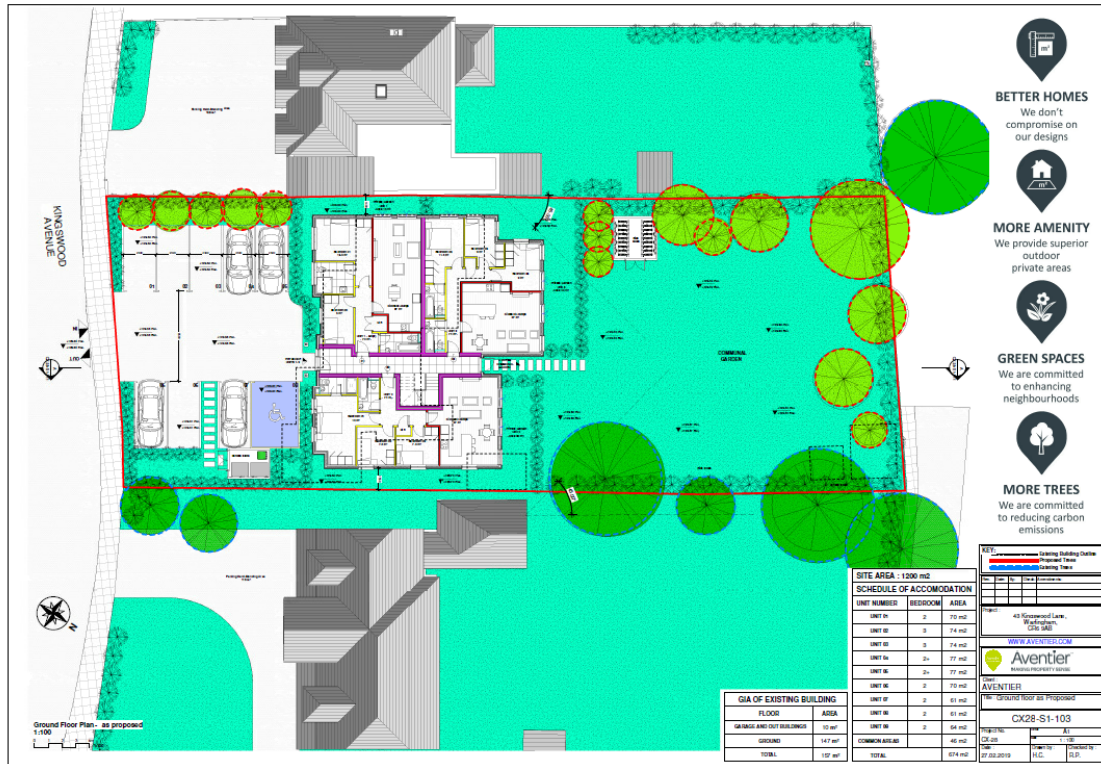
Ground floor plan proposed site showing proposal in relation to neighbouring properties
